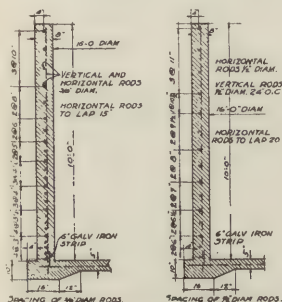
Details Showing Arrangement of Reinforcing Rods in Circular Tank.
